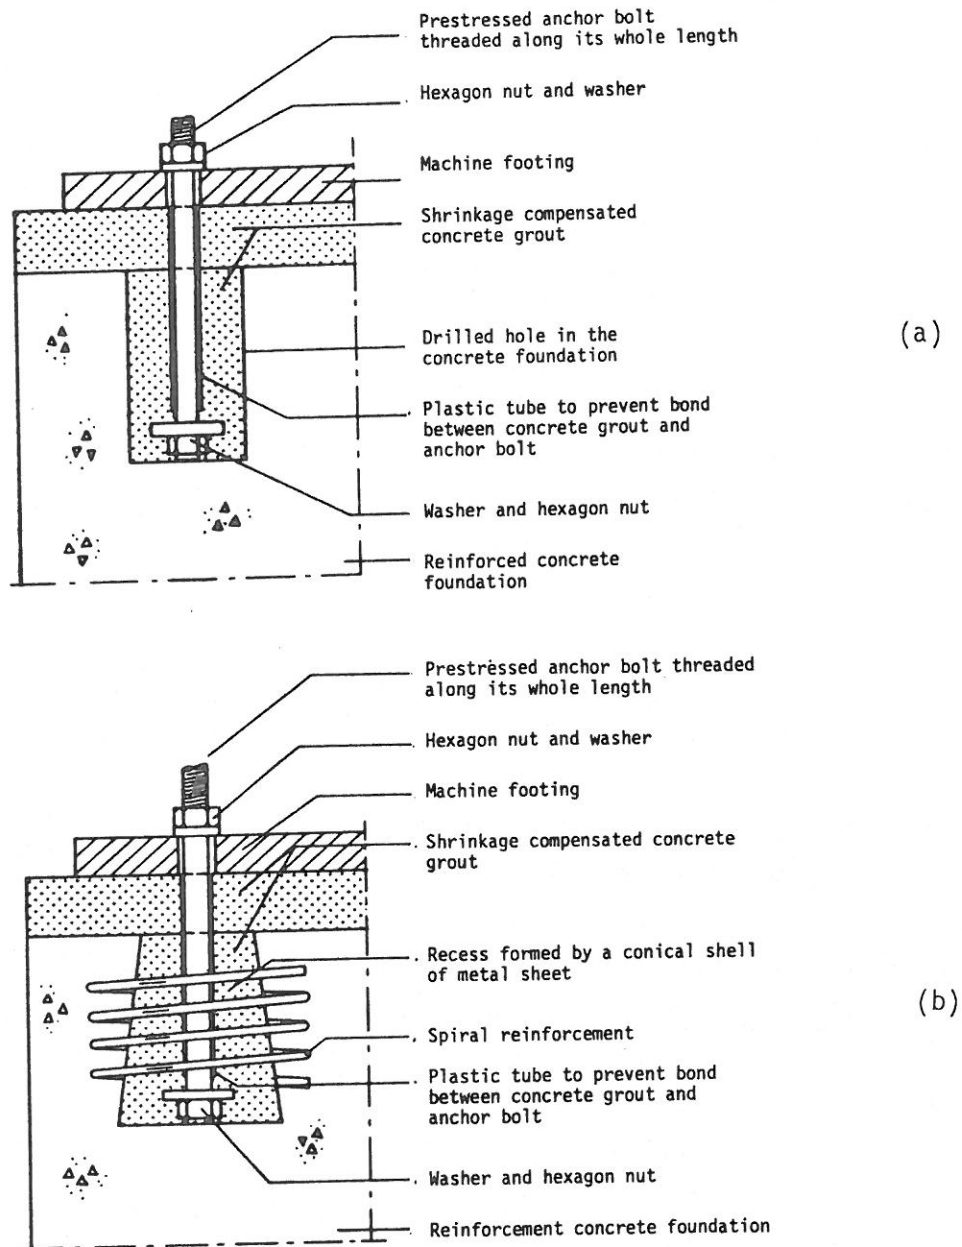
Two tested major types of prestressed anchor bolt arrangements
